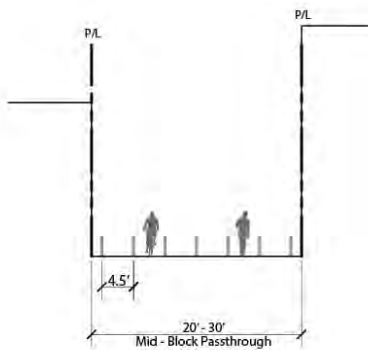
Mid-Block Passthrough Typical Cross-Section. Source (right): One Colorado Pasadena Social Media.
